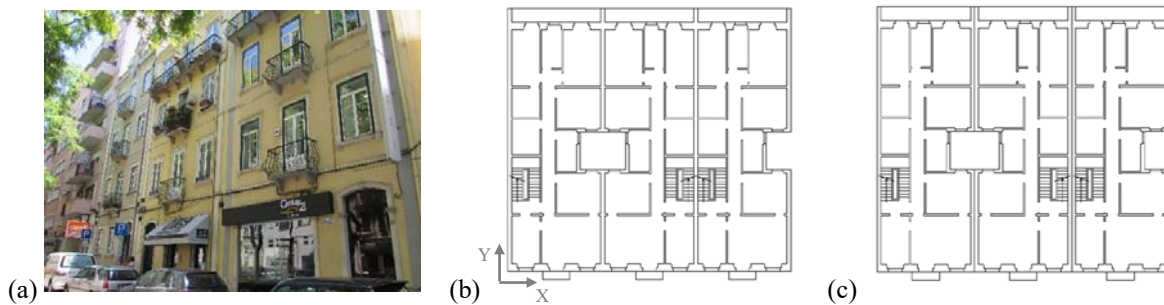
URM buildings: (a) view from the block of buildings in “Avenidas Novas”, (b) group of buildings with shared side walls and (c) group of buildings with independent side walls
